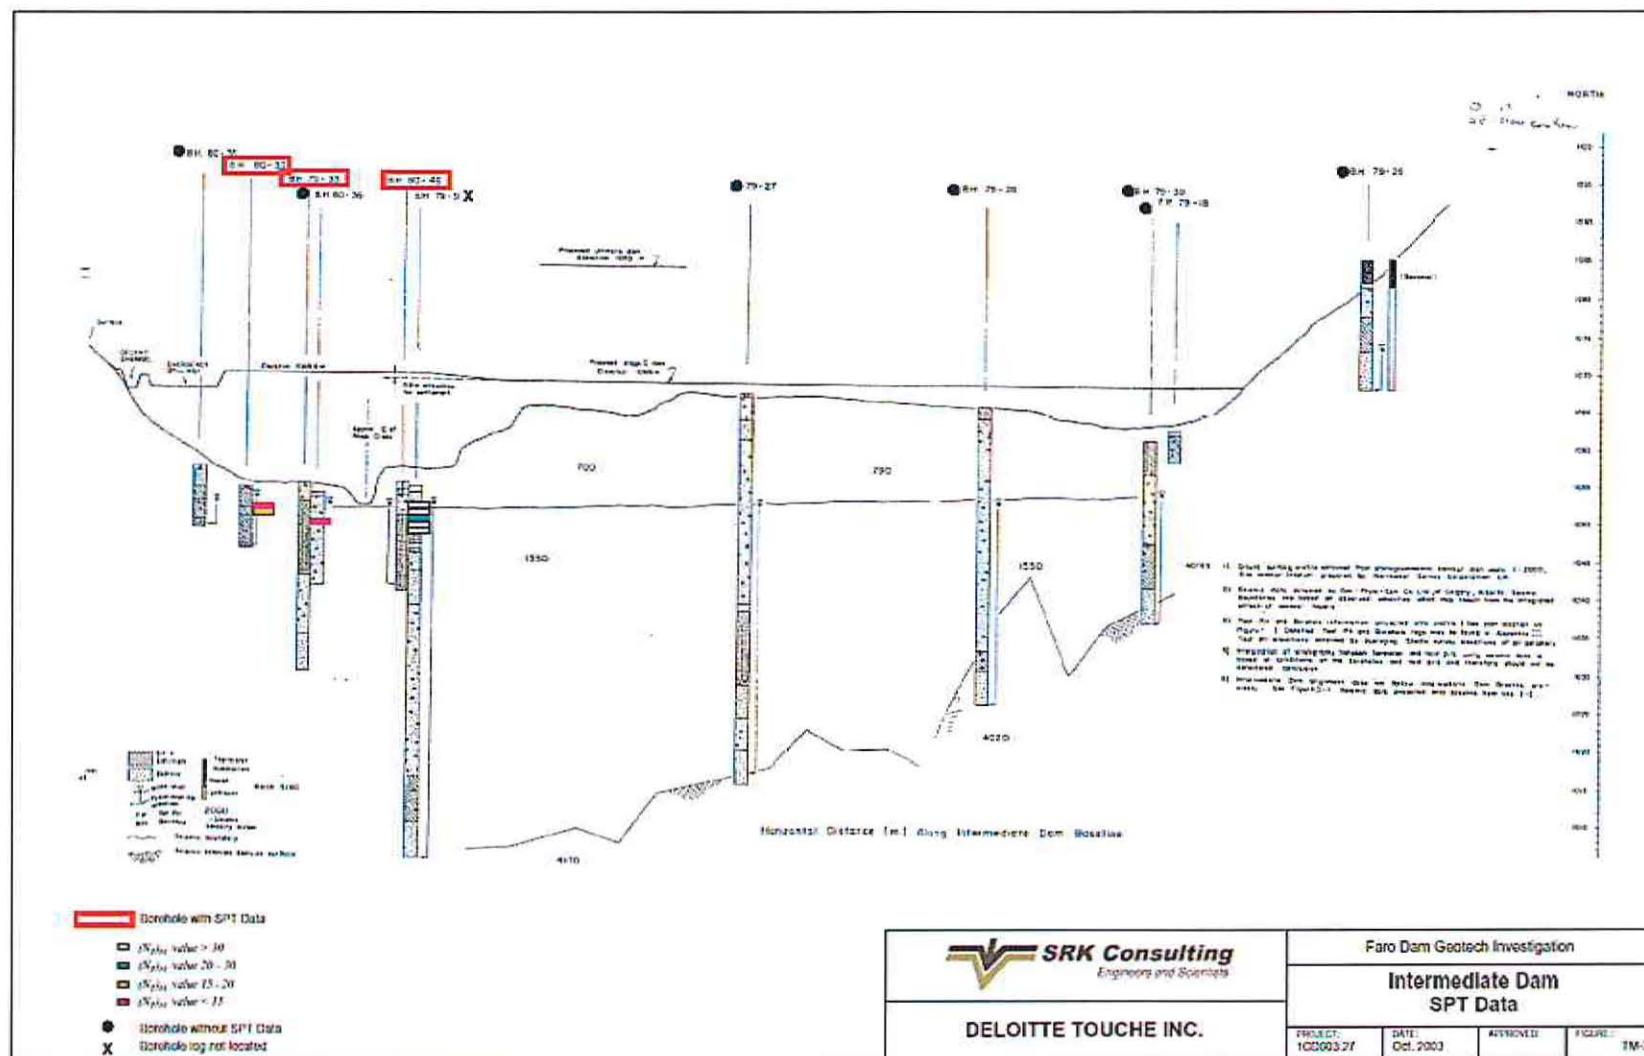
Longitudinal section of Intermediate Dam foundation along with drilled boreholes positions
